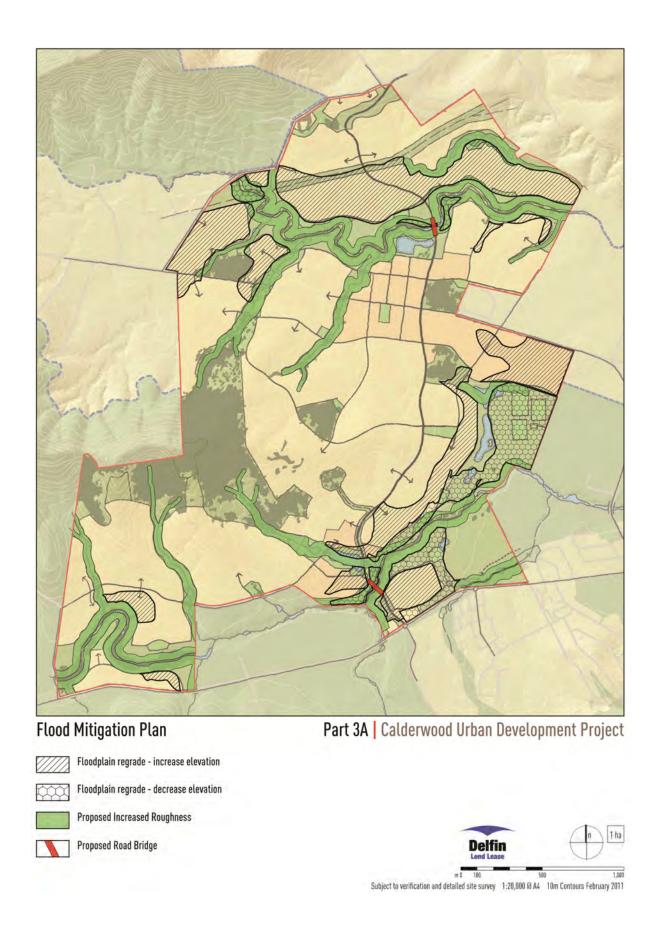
Approved Concept Plan Flood Mitigation Plan
